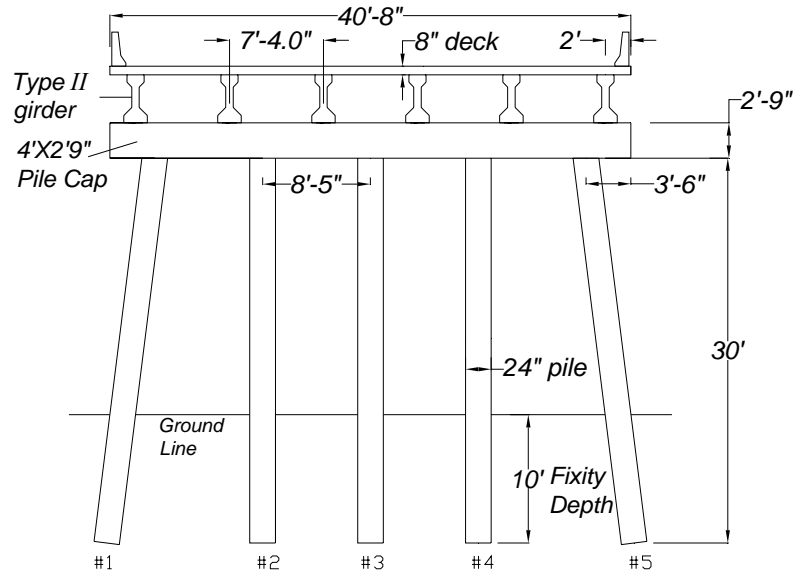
Typical cross section of a 50ft span Pile Bent Type Bridge.
